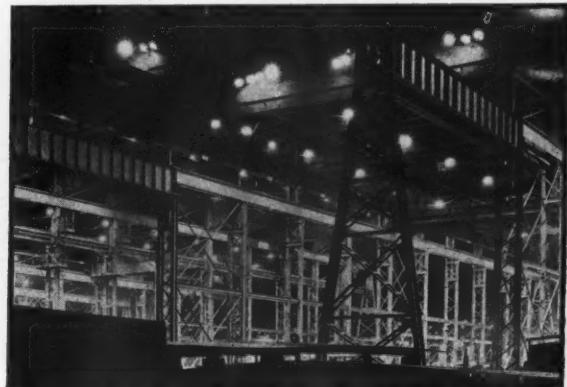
PLATE SHOP with lighting units mounted on wall sections just below the roof. Interior lighting is high bay incandescent.
